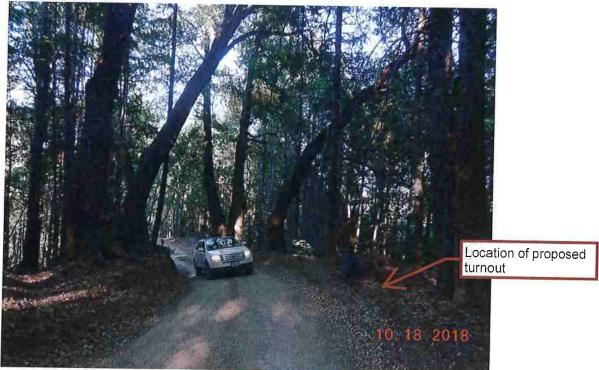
RP6. Pinch point and sight distance restriction. No turn out provided. Facing north. Install turnout south of RP6.
